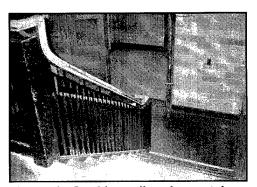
Corridor wall encloses stairwell, which meets the fire safety codes.
